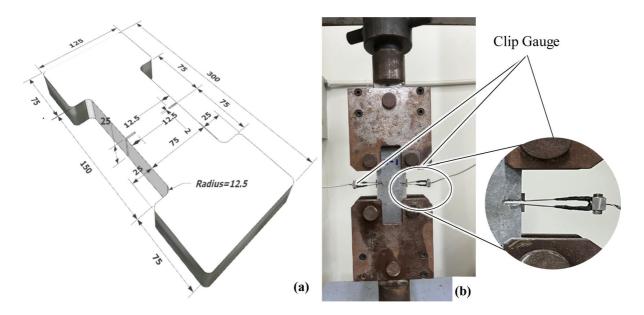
Direct tensile test: a dimensions of specimen (unit: mm).; and b set-up and strain gauges
